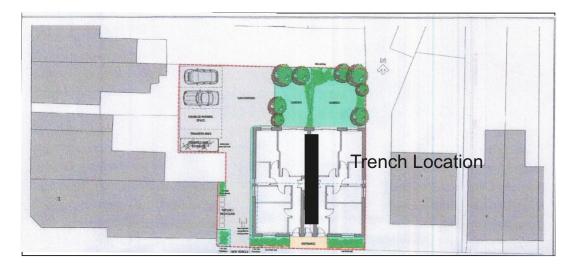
Trench location over new development plan at a scale of 1:500 reproduced from Howard Fairbarn Architects obtained from online planning register.
